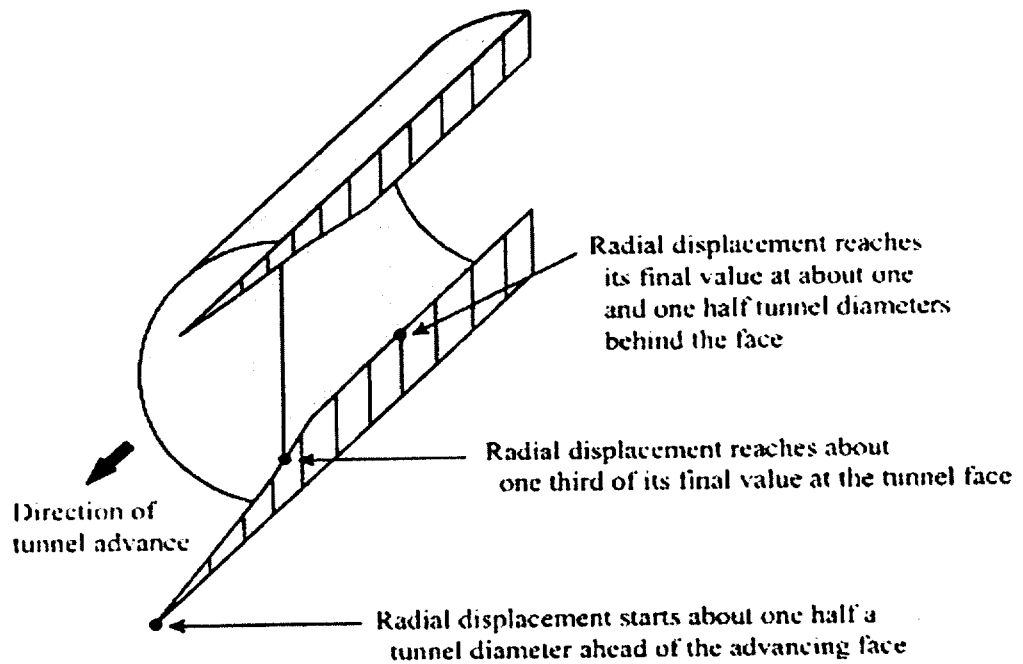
Radial deformation in the roof and floor of an advancing tunnel.
